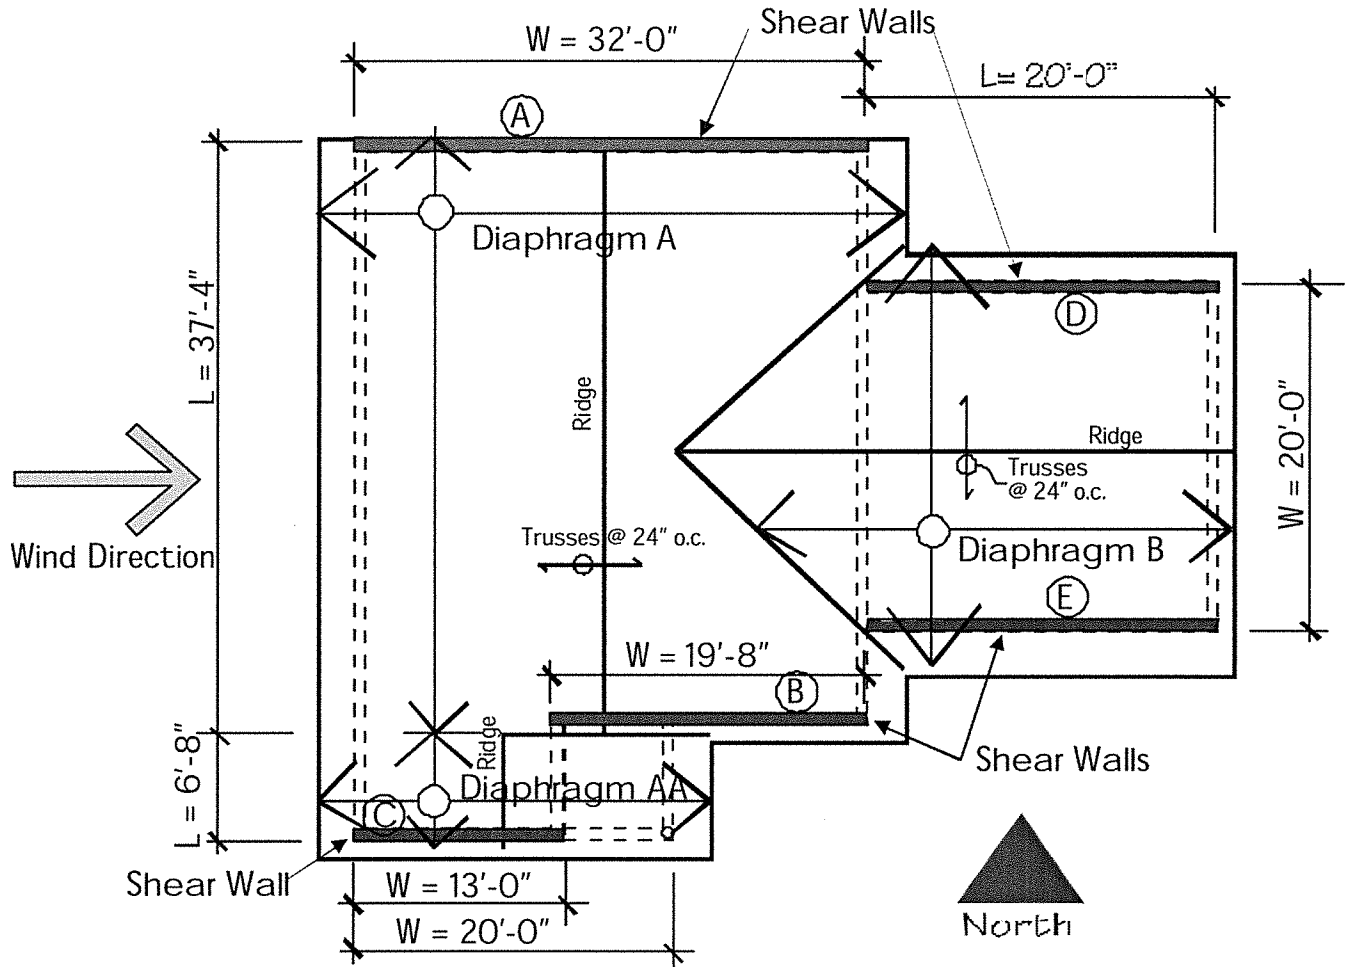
East/West Direction for Roof Diaphragms and Shear Walls
